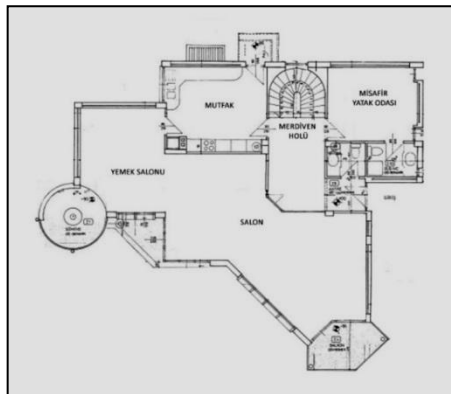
Floor plan of Orhangazi avenue, no:86 [157]
